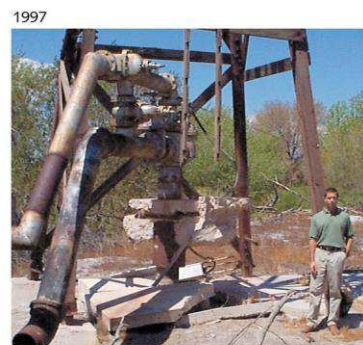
A protruding well- west of downtown, Las Vegas (after subsiding, 1997)
